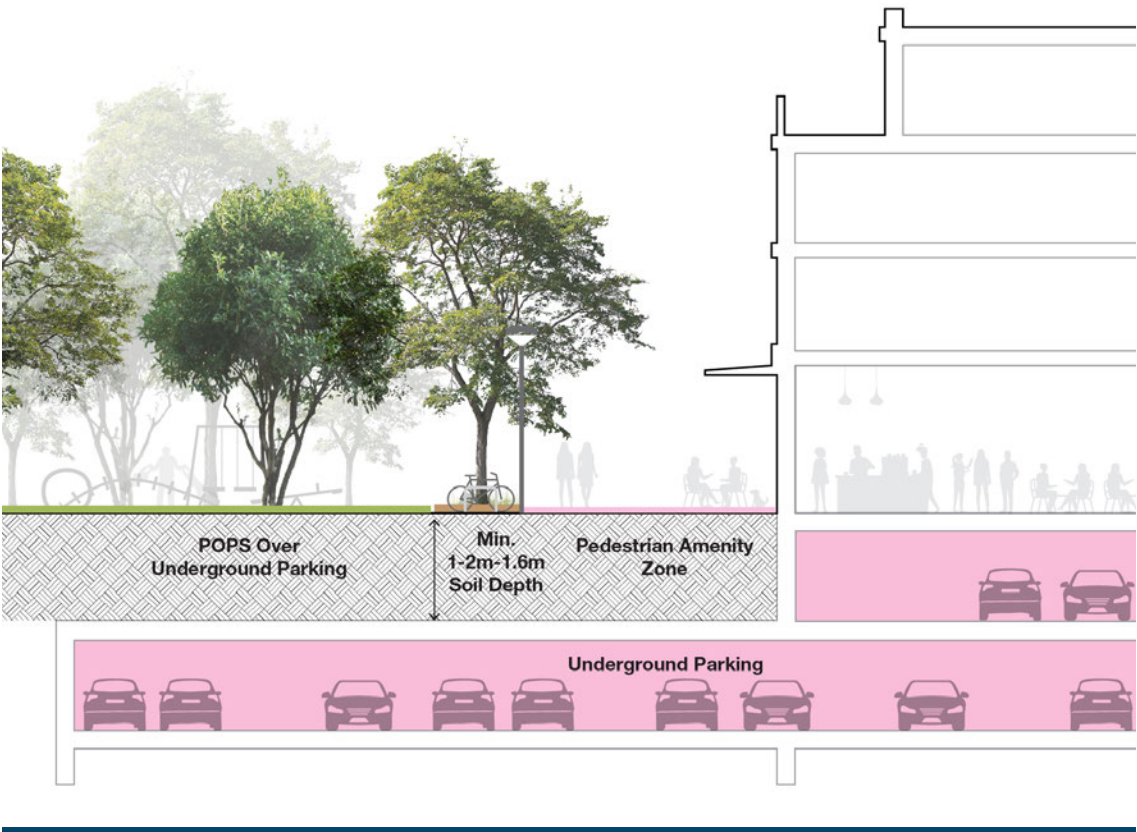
Underground parking facilities may be located within the subject site and below amenity spaces and POPS.
